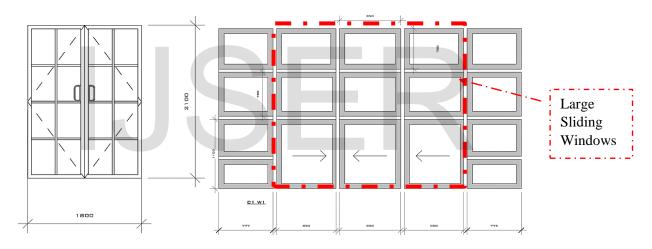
Large double swing casement doors and the sliding window of the Glass house. Source: Researcher's Fieldwork, 2022
